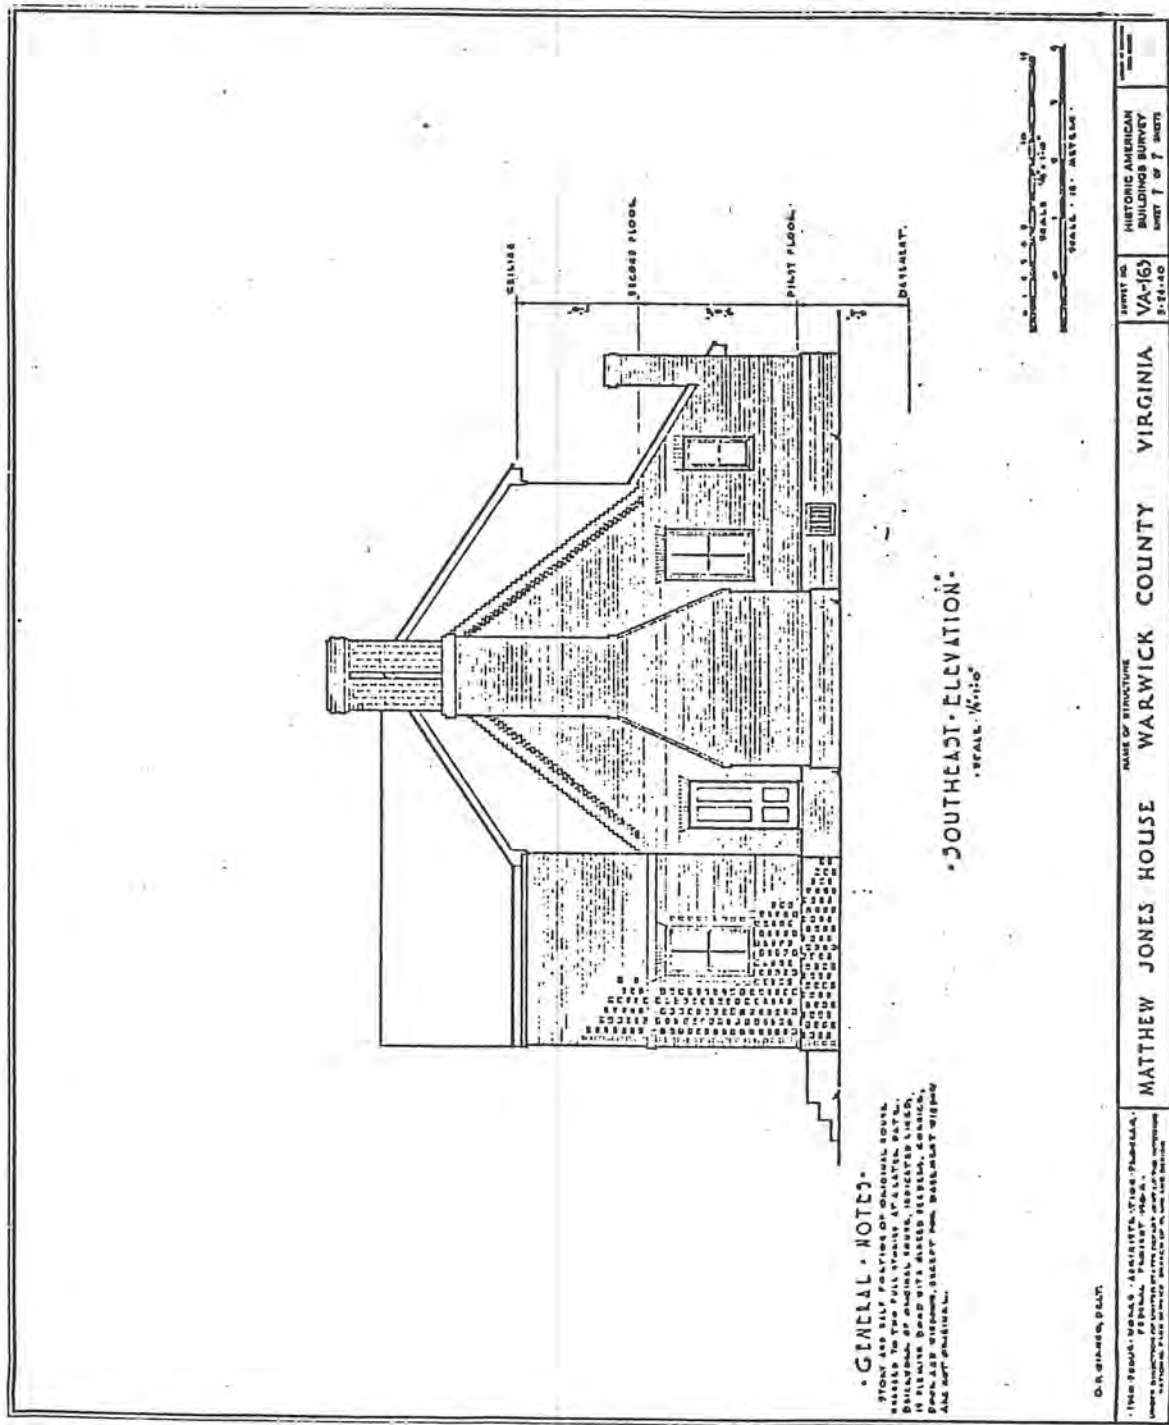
Matthew Jones House, HABS drawing (1940), southeast elevation.
